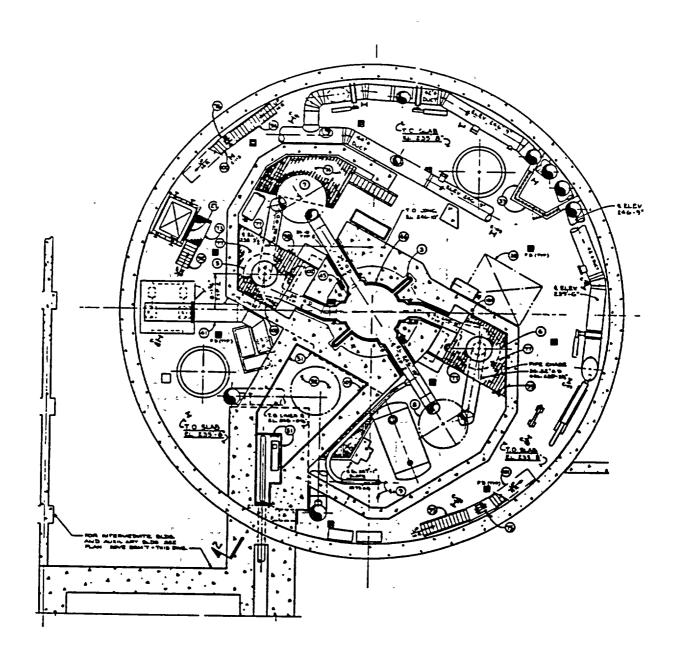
Plan View of the Ginna Large, Dry Containment Below the Elevation of the Operating Floor
